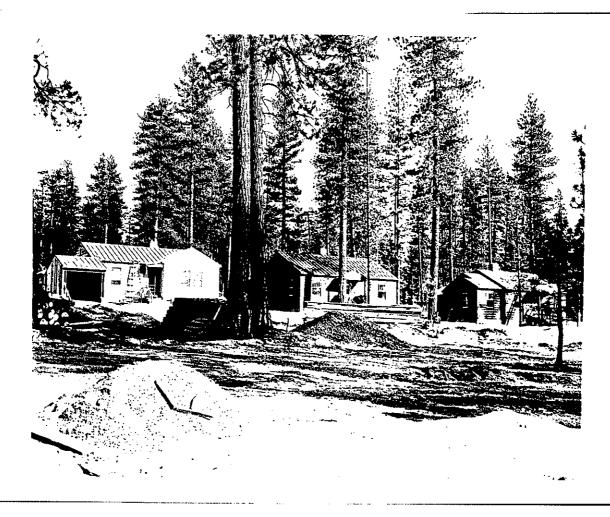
Gilchrist houses under construction, 1940 (OHS photo #005678)
